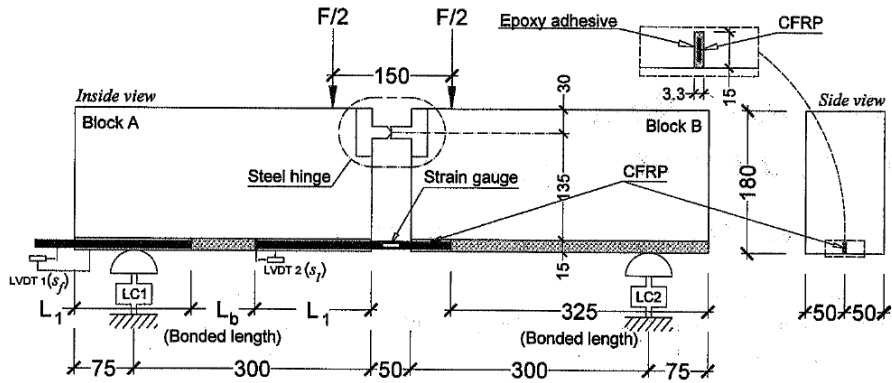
Test specimen configuration and test setup used by Sena Cruz and Barros [27] (units in mm).
